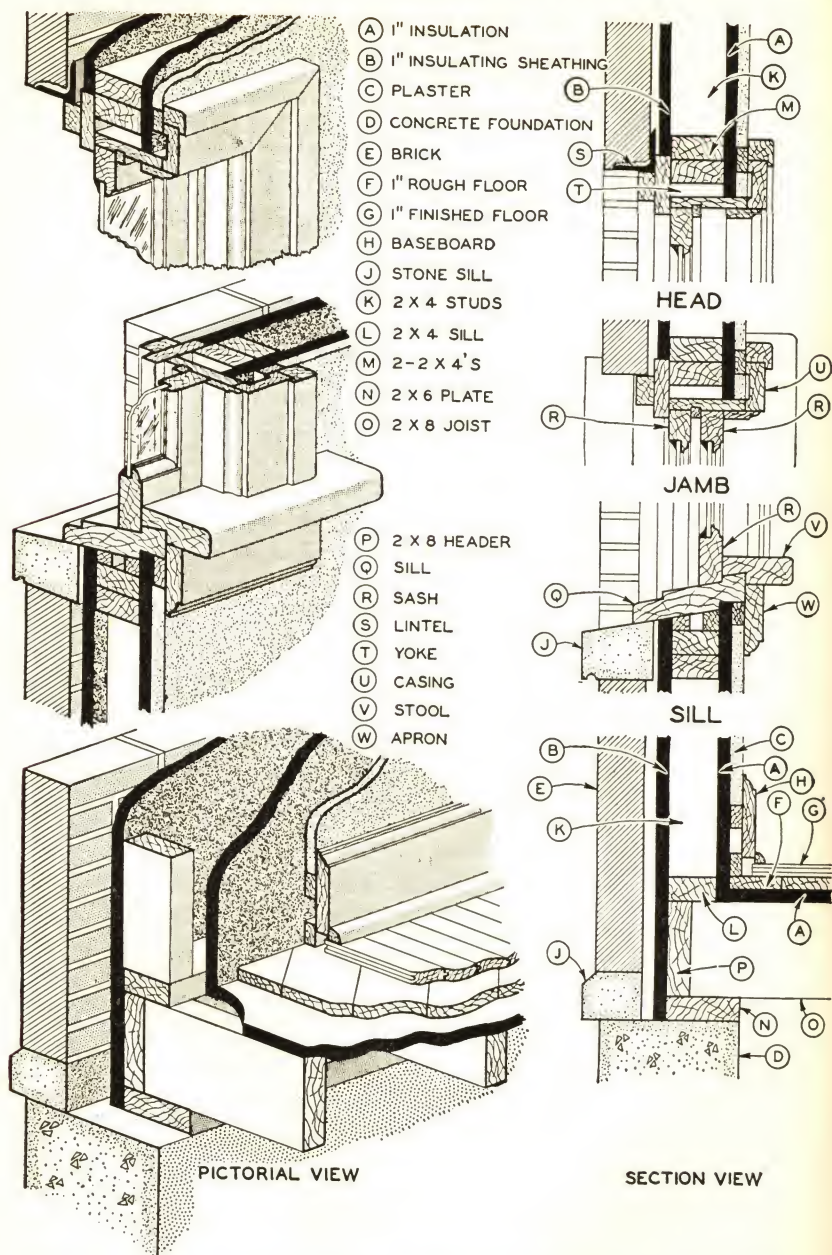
Pictorial and Section View of a Window in a Brick Veneer on Frame Wall
